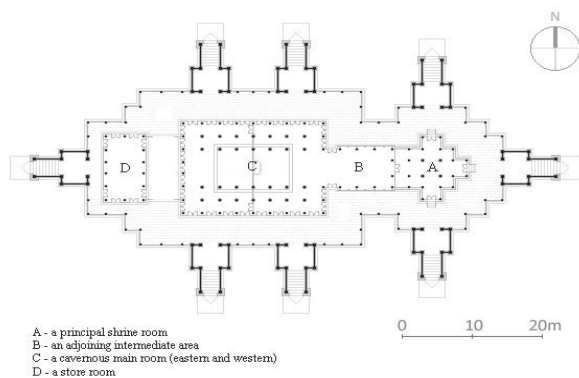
A Typical Plan Layout of Wooden Monastery*1
